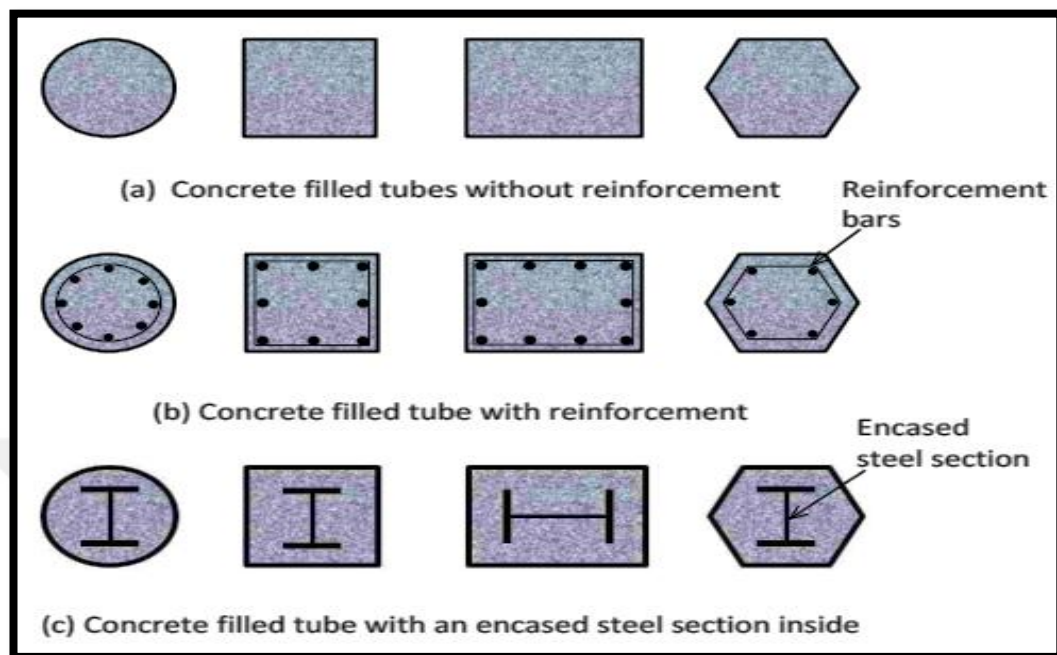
Types of double symmetric concrete filled steel tubular members (BC4, 2015)
